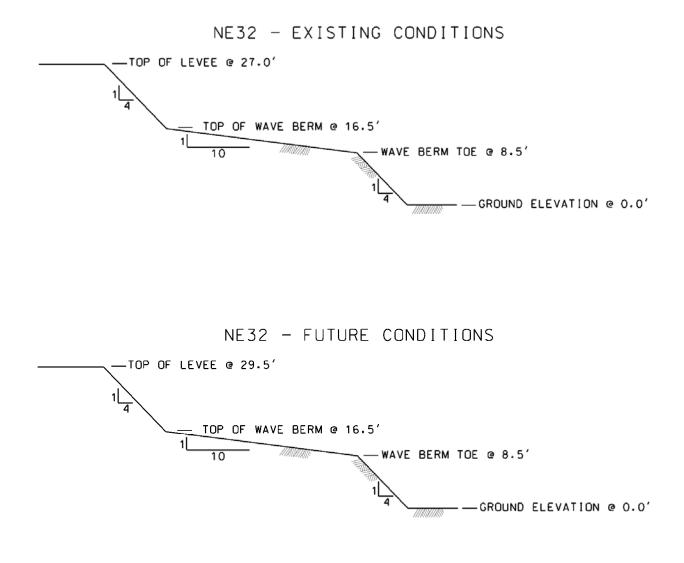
Typical Levee Design Cross-sections New Orleans East Back Levee (NE32)
